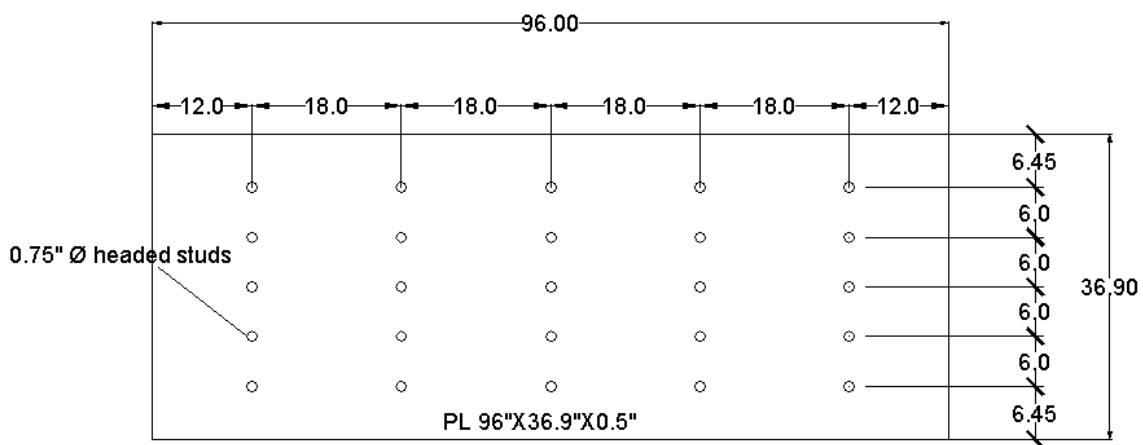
Precast Girder Reinforcement at Shoe Plate Location
